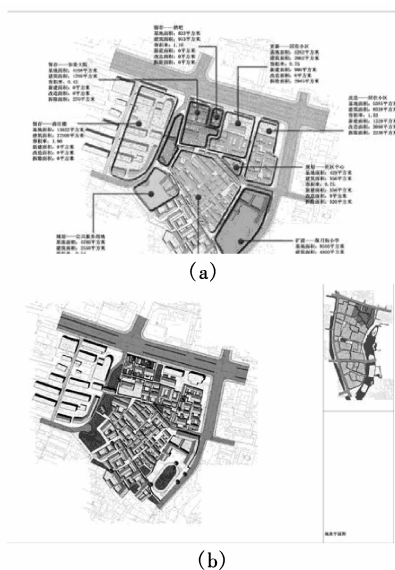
Pilot project. (a) Analysis plan; (b) Proposal plan
